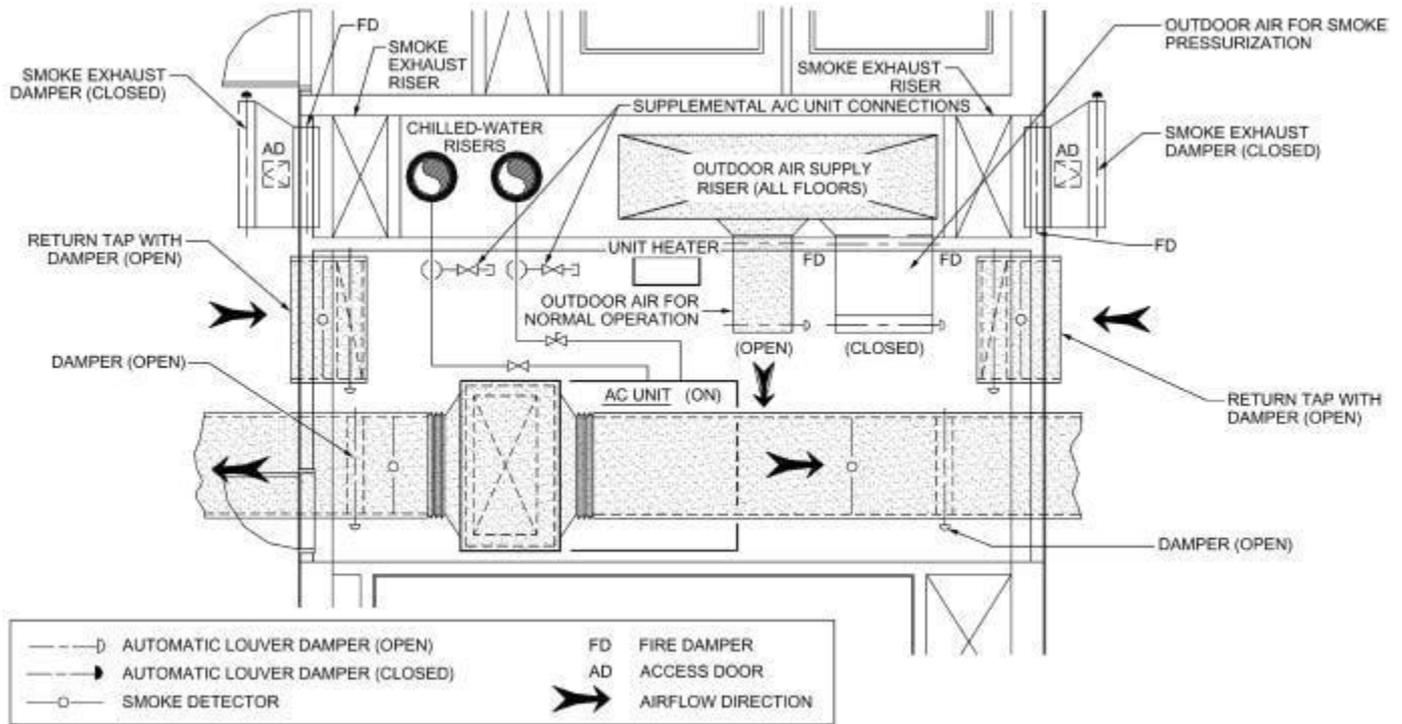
Floor-By-Floor Air-Conditioning Unit Layout (Normal Operation)
